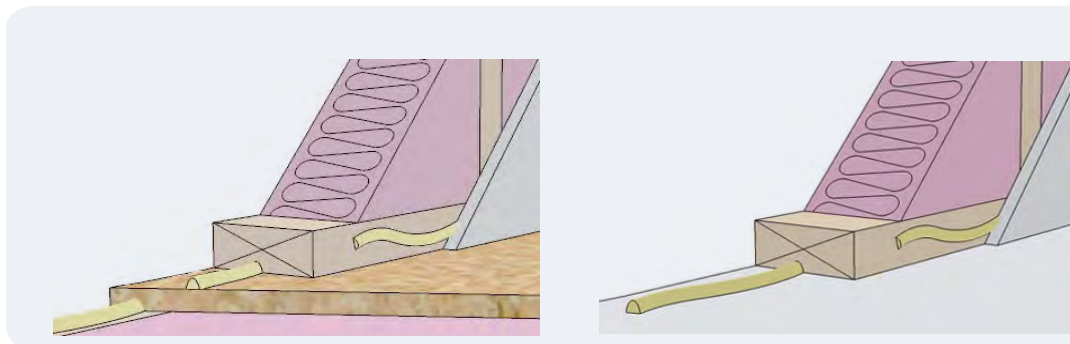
Sealing wall to floor. Apply weatherproof sealant between the bottom plate and flooring.
